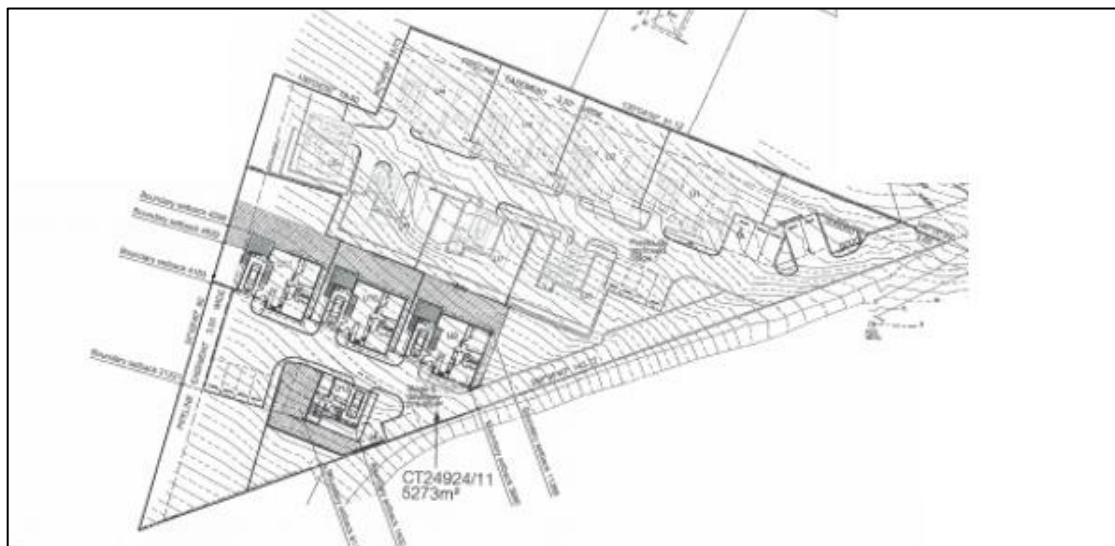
Approved Plan PLN-17-003 – Wilson Homes
